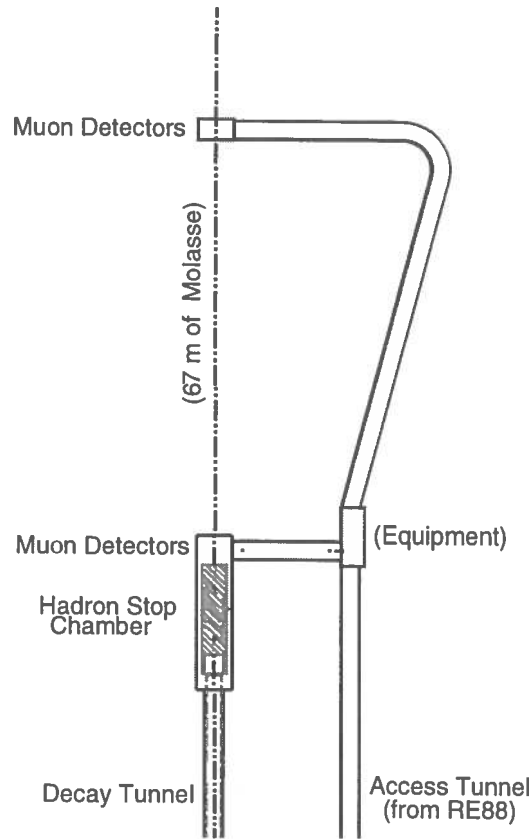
Schematic layout of the hadron stop chamber, the muon chambers, and their access tunnels
